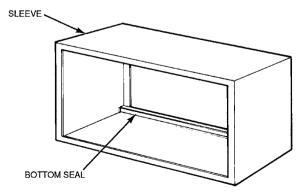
Remove Bottom Seal From GE Plastic Sleeve
